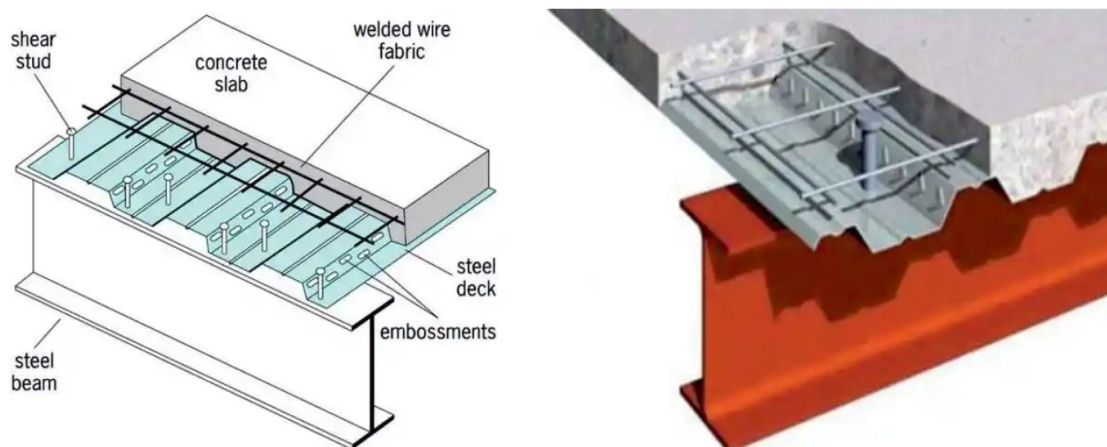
Components of Concrete Steel Composite Floor [6]
